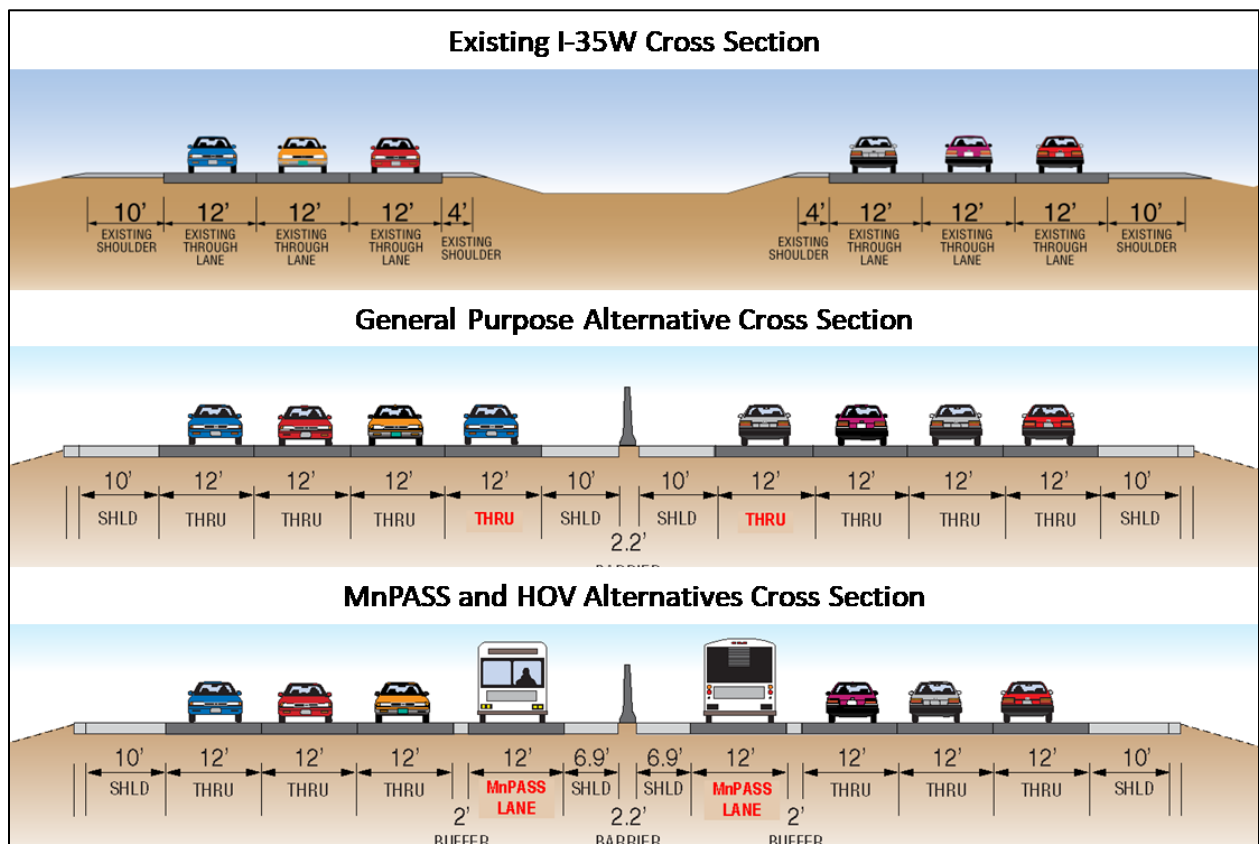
Cross section of I-35W North MnPASS alternatives
